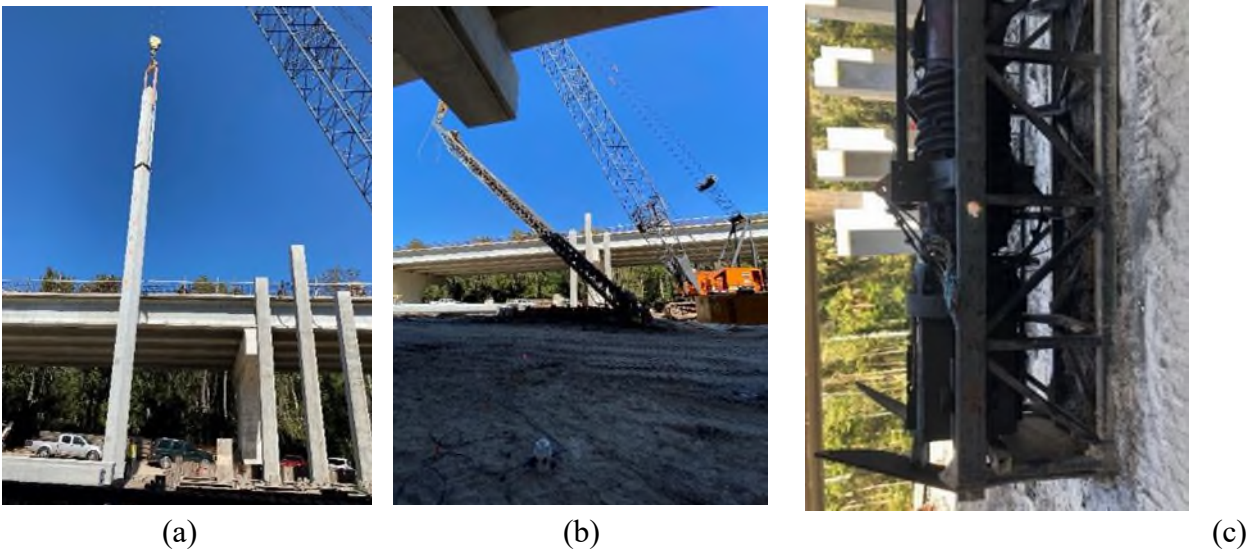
Pile driving process at Site B: (a) prestressed concrete pile hoisting, (b) hammer in leads, and (c) APE hammer used for pile driving operation.
